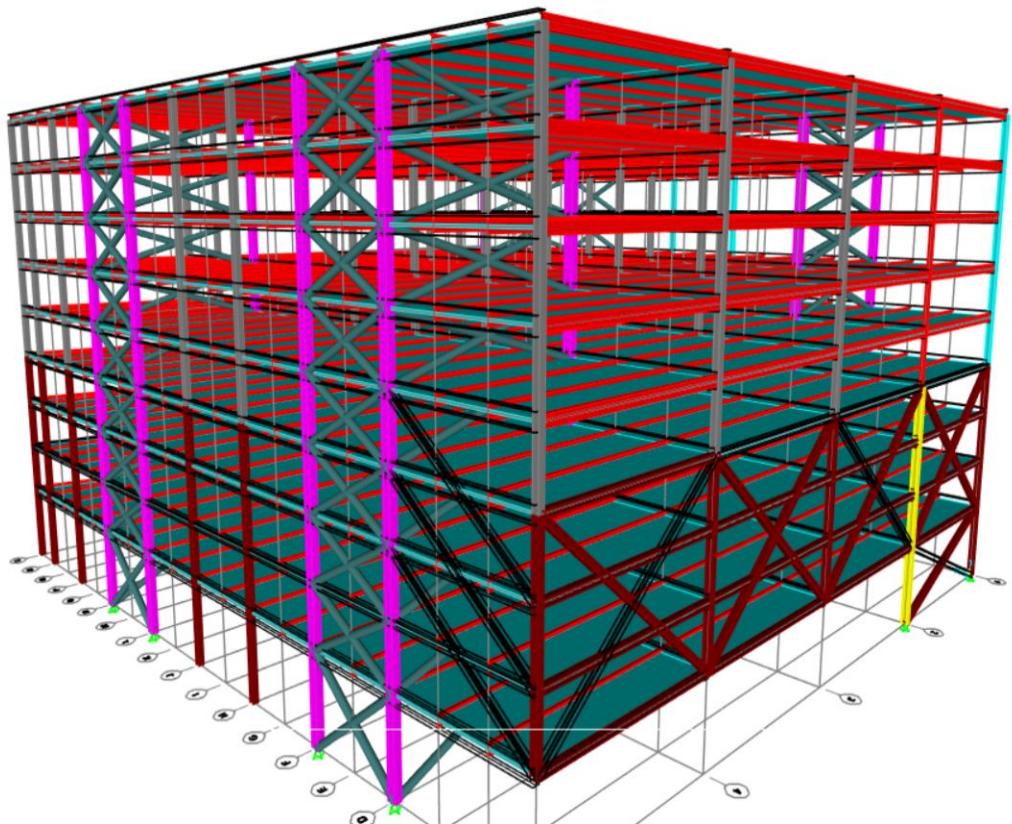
Global Structural Model for Proposal 1 (SAP2000)
